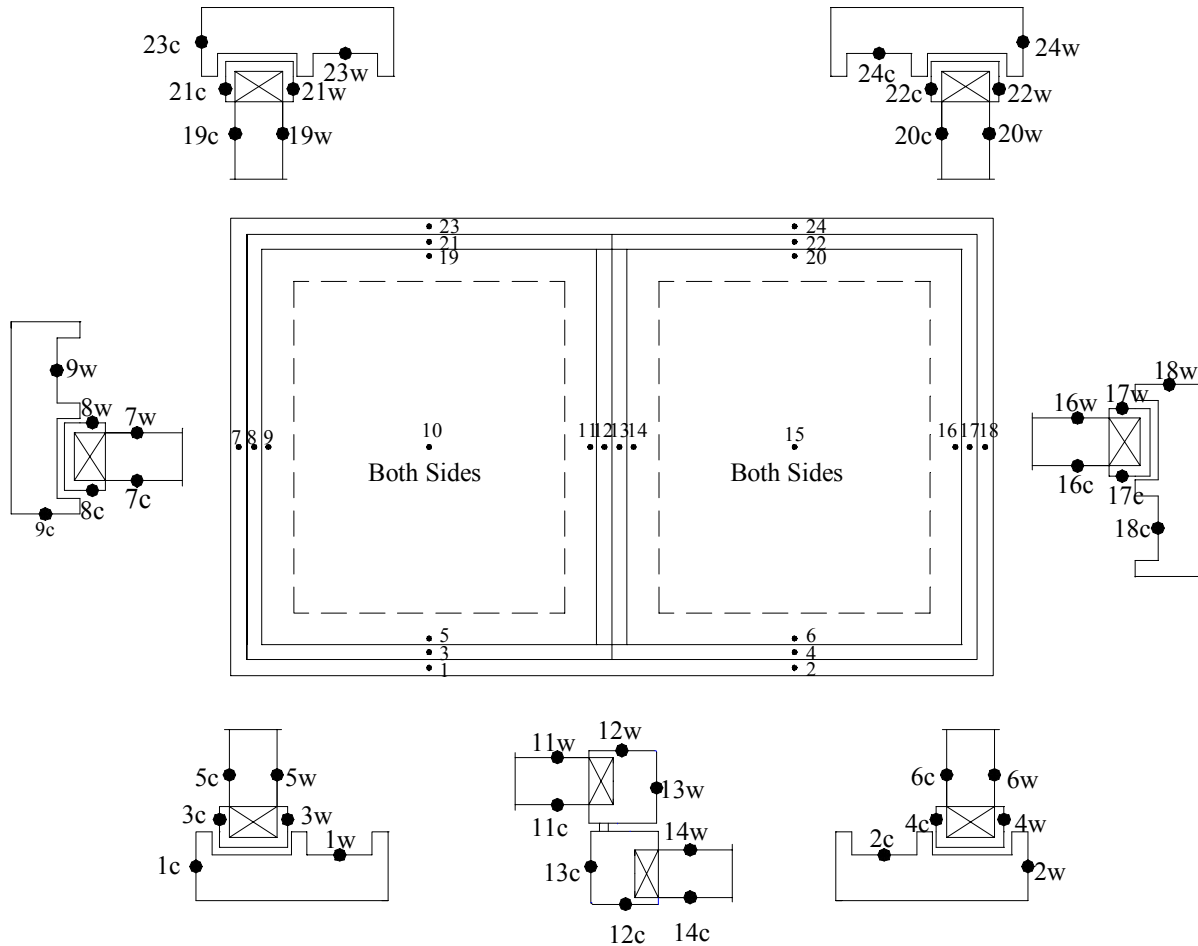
Glazed Wall and Sloped Glazing Thermocouple Placement
